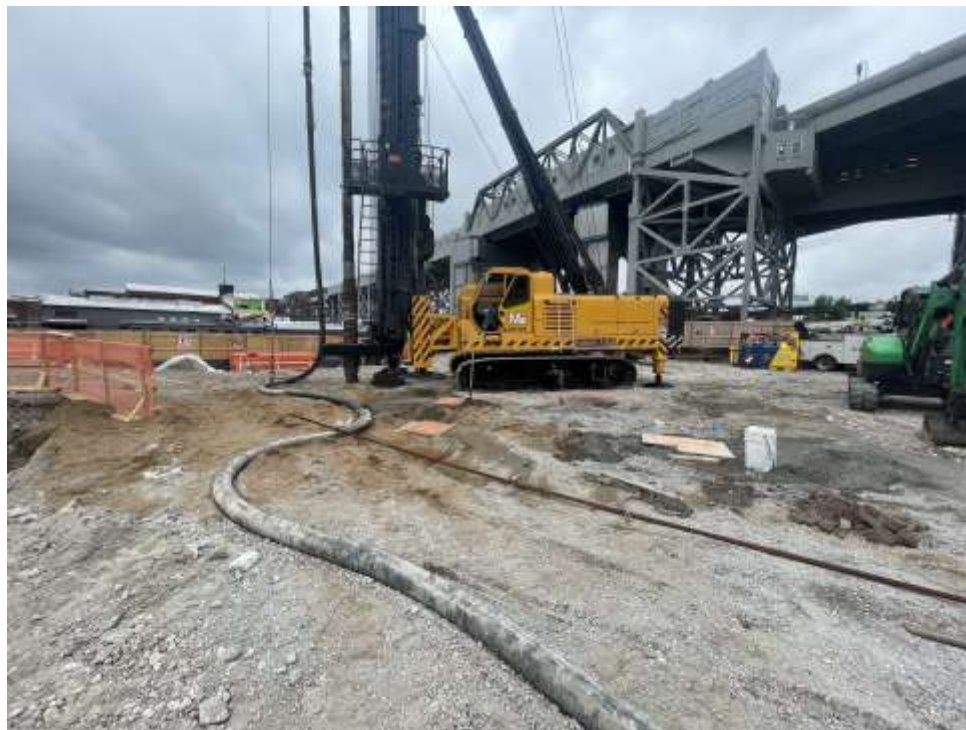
Morris-Shea advancing test piles in the southeastern part of the site (facing southeast).
